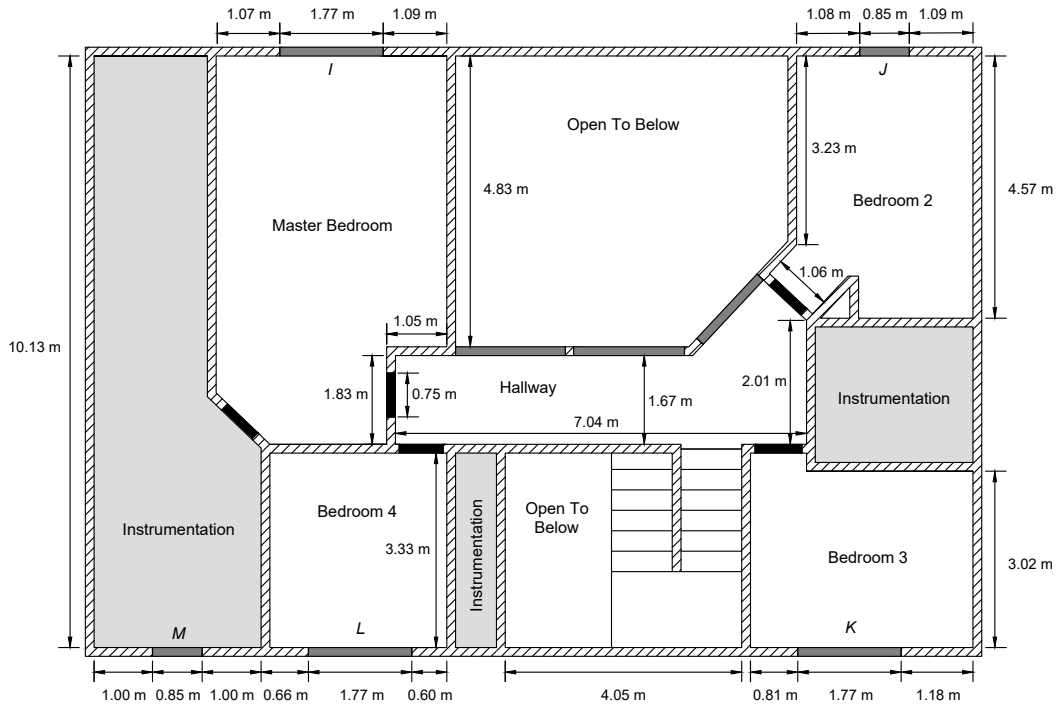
Dimensioned plan view drawing of the second story of the two-story structure
